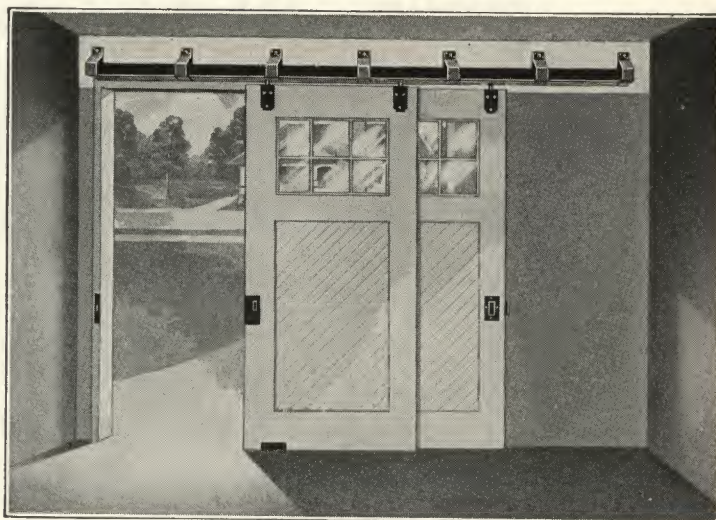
Interior View of One Car Garage. Doors without Weatherstrip
